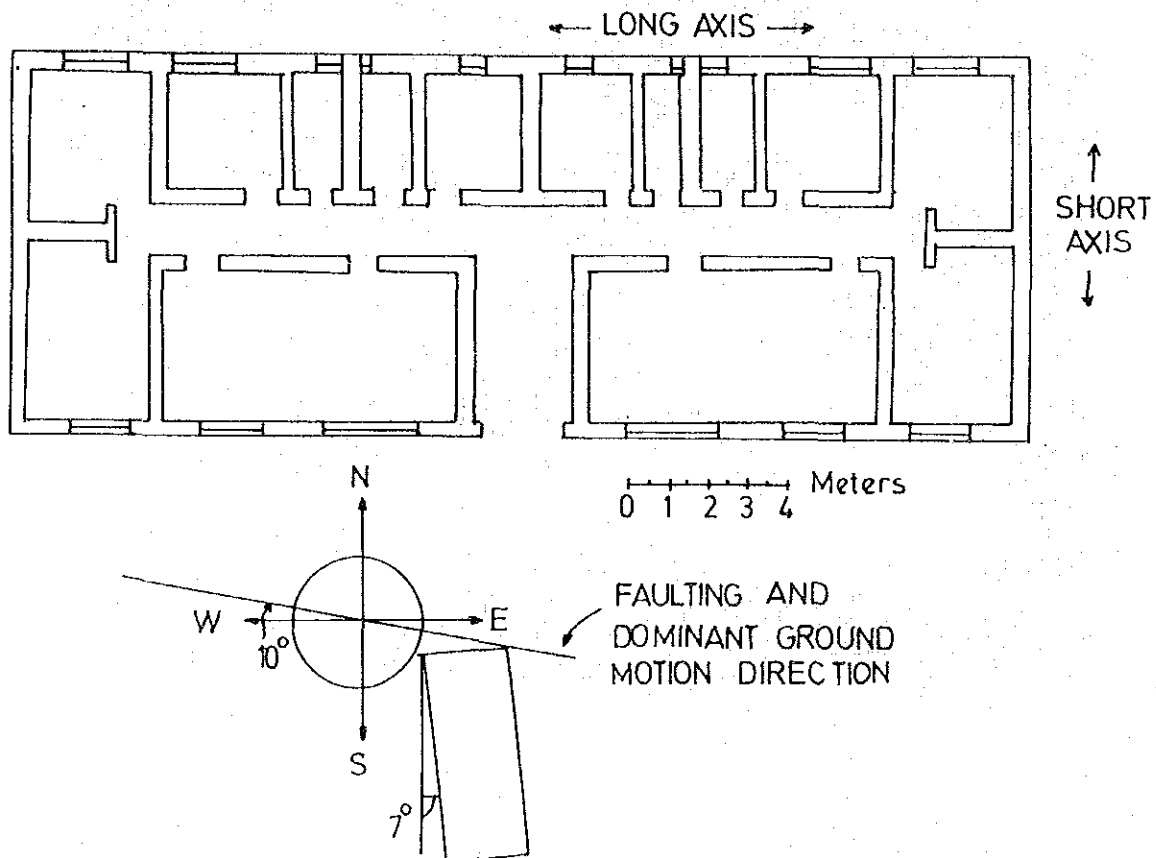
Plan and Orientation of Çaldıran Staff Housing.
